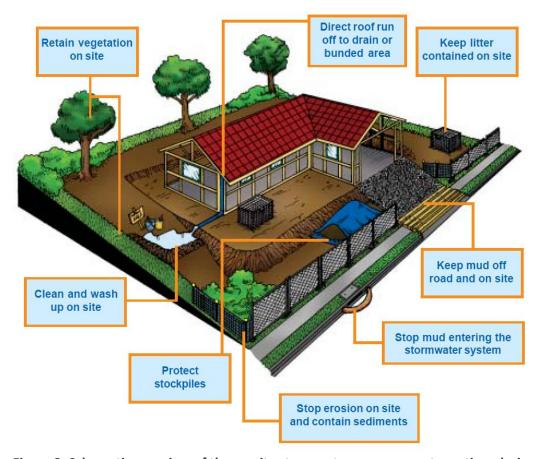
Schematic overview of the on-site stormwater management practices during construction
